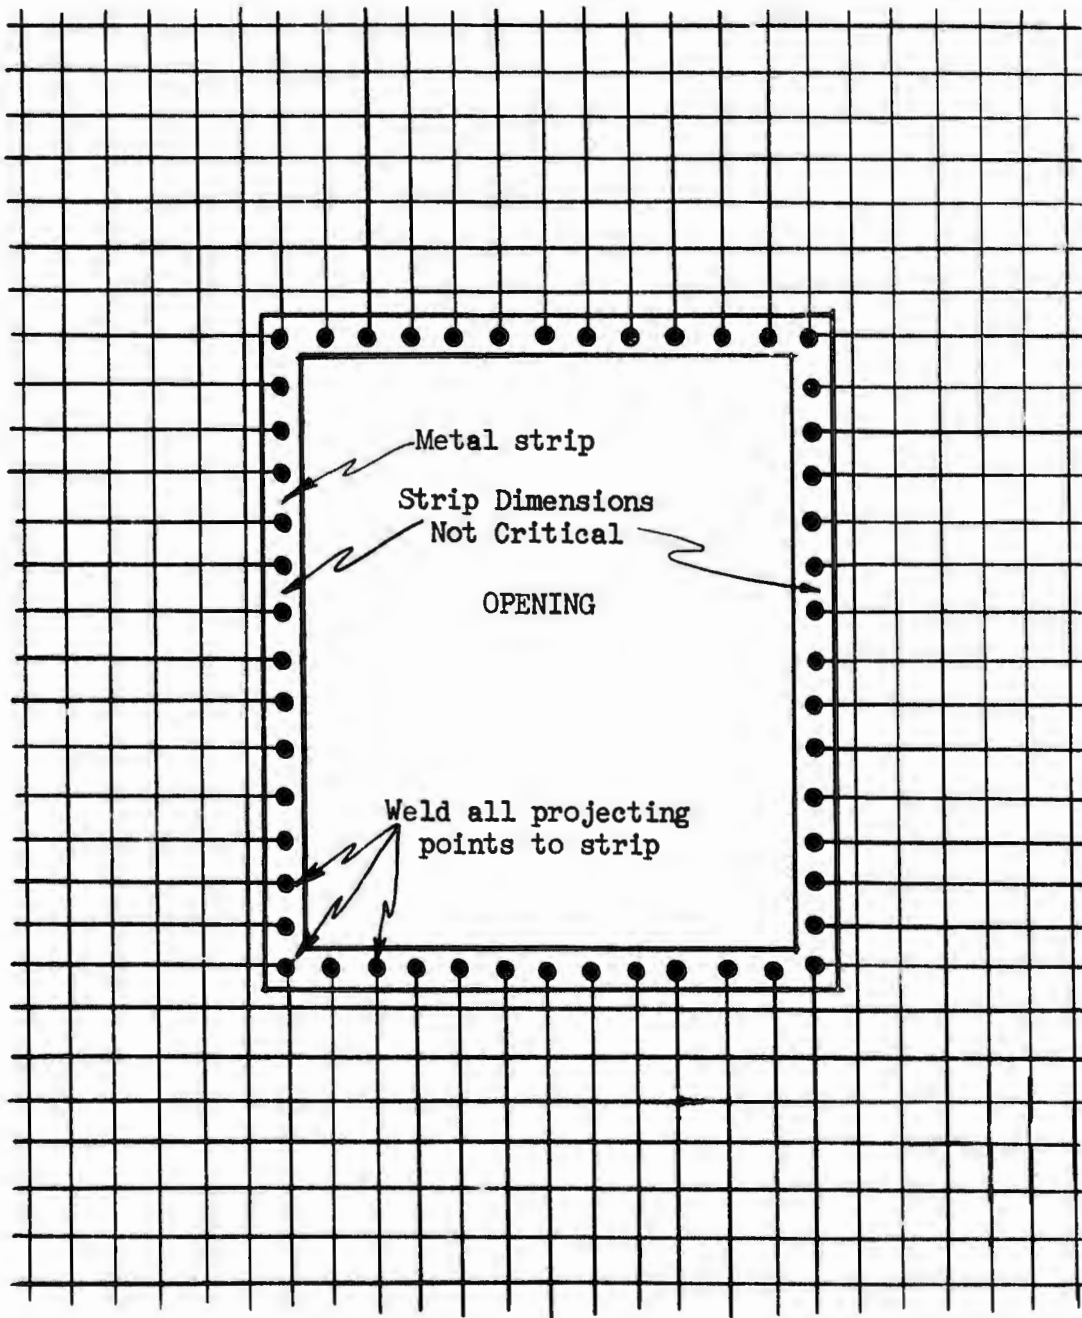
Termination of Welded Wire Fabric at an Opening
